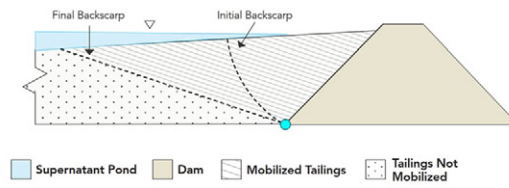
Schematic of the cross-section of the failure surface for a TSF (modified from CDA, 2021)
